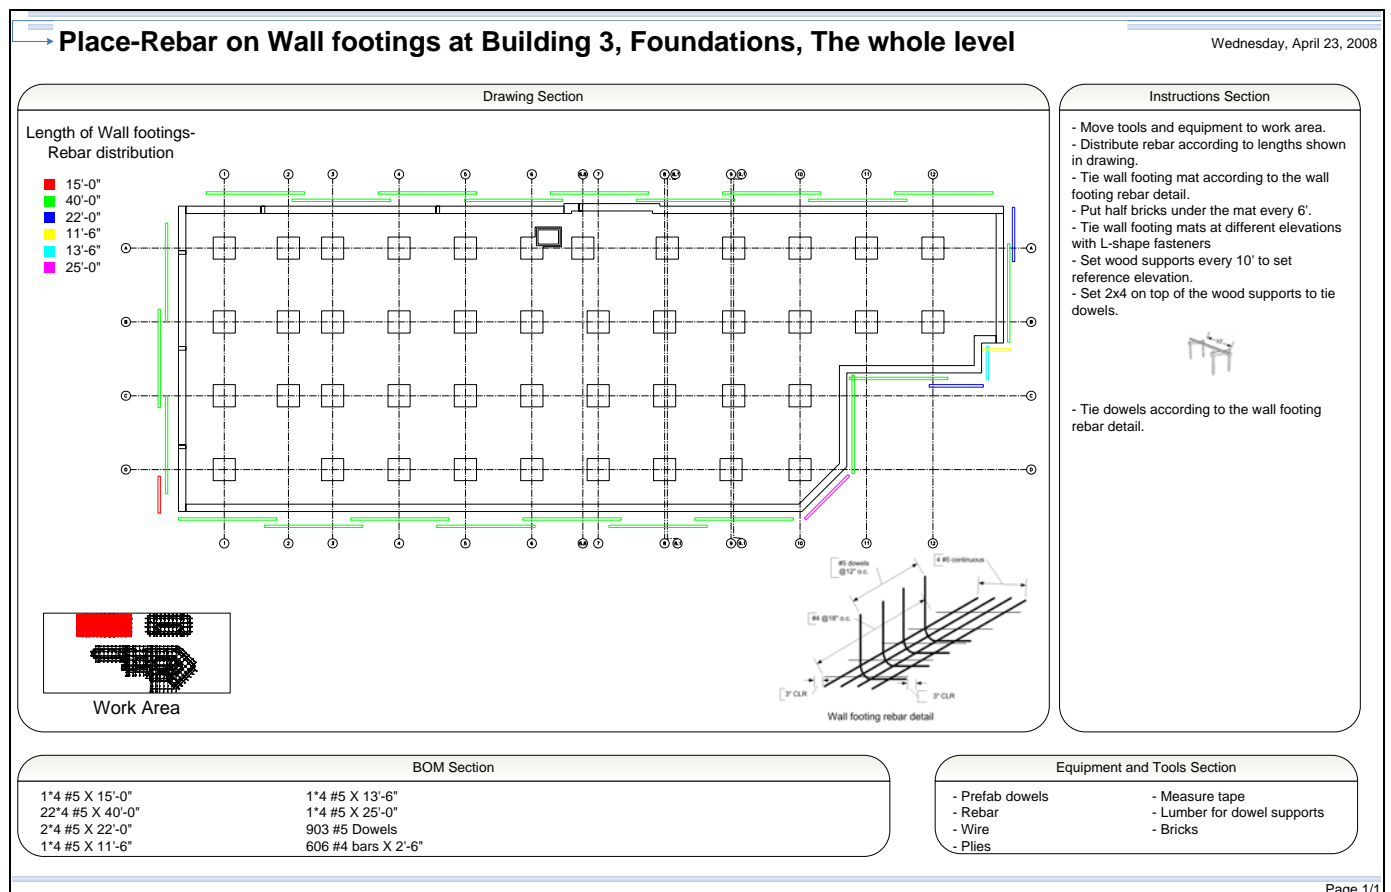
Example of a field instruction for the activity example (Place-Rebar-Wall footings-Building 3, Foundations, The whole level).
